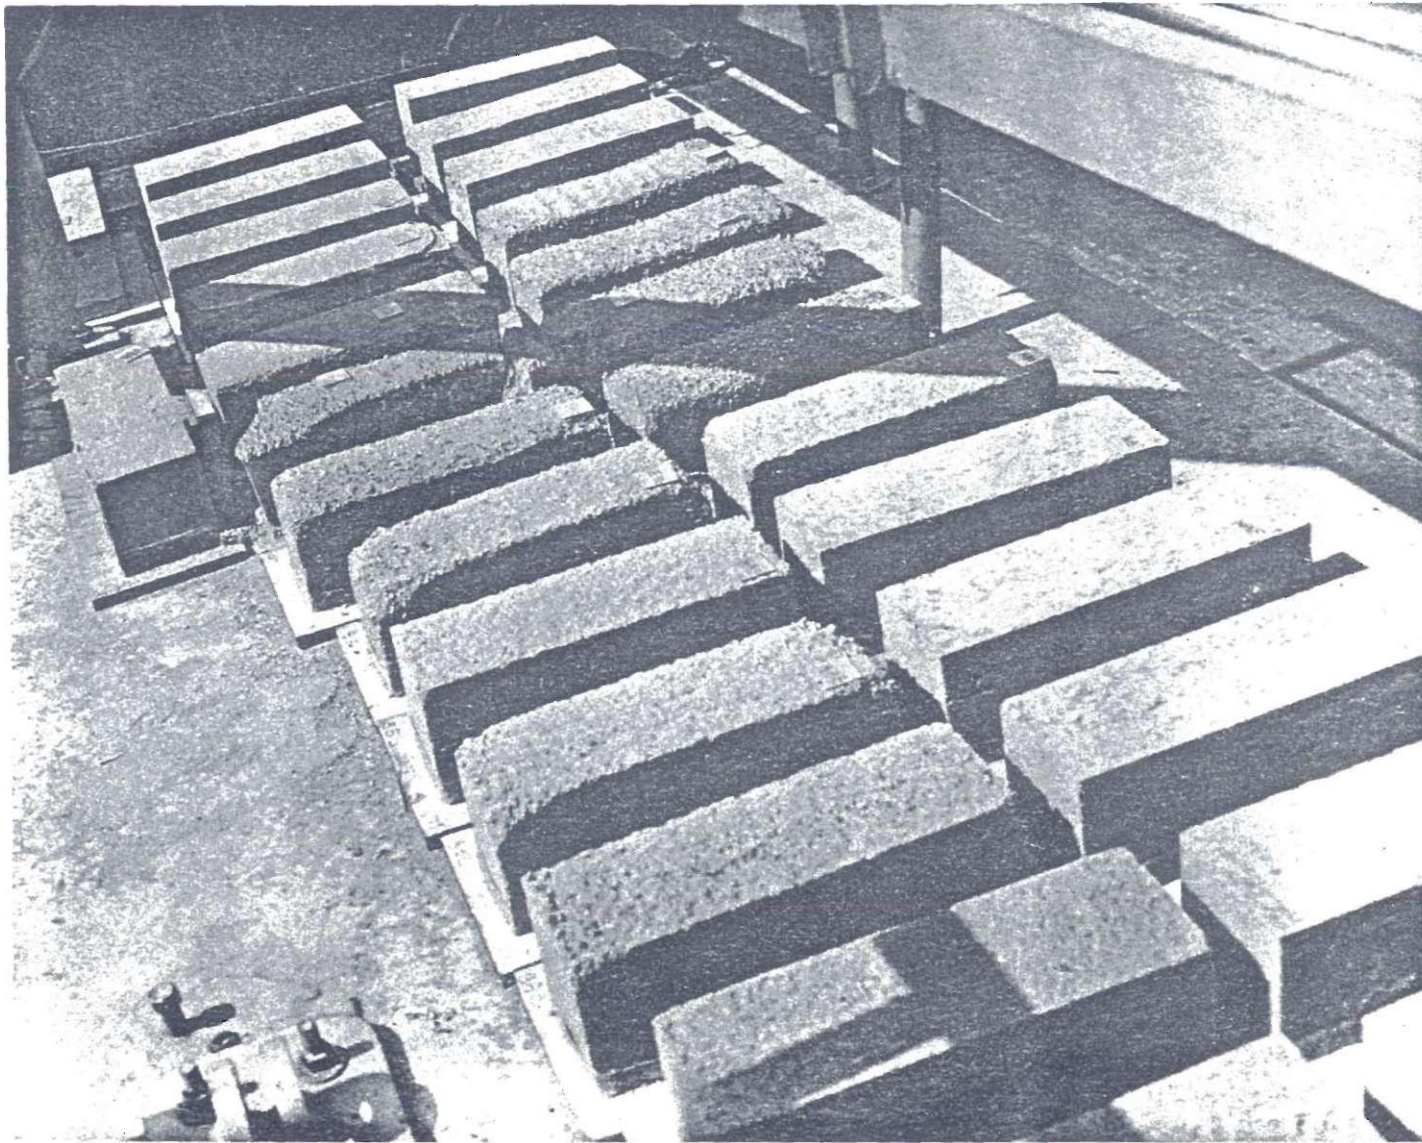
Soils B and C Specimens Being Subjected to Outside Exposure .
